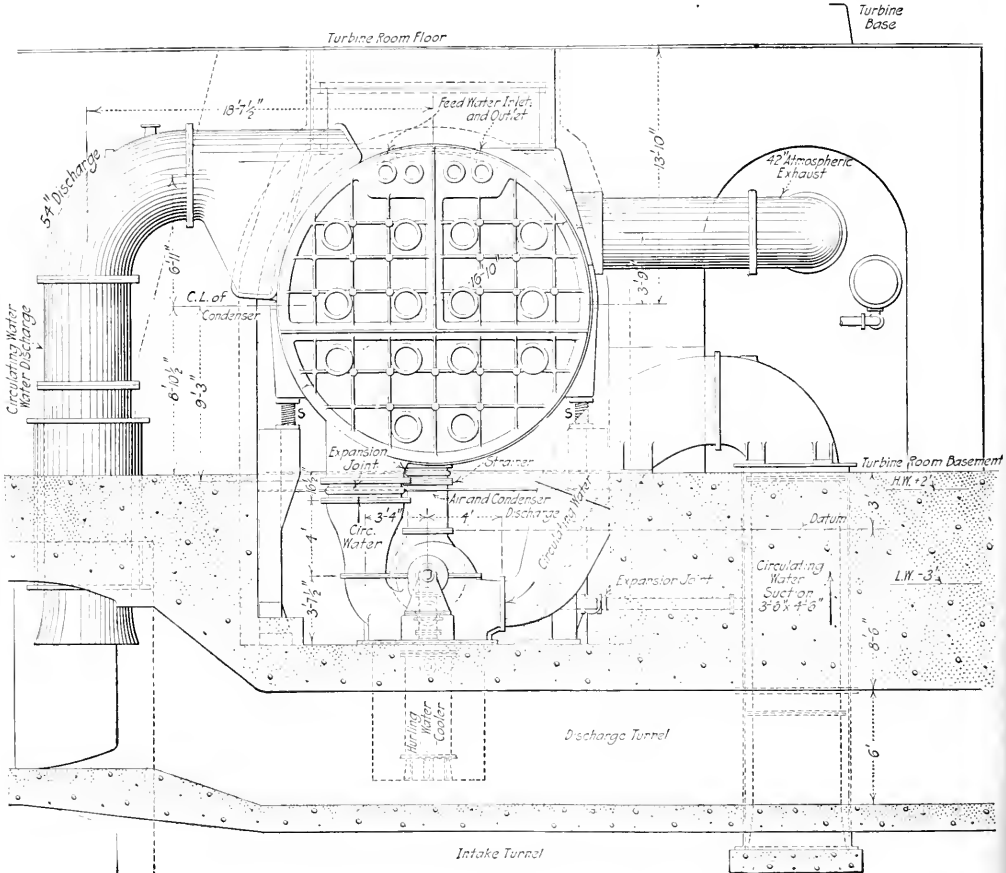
END ELEVATION OF LARGE WHEELER SURFACE CONDENSER
